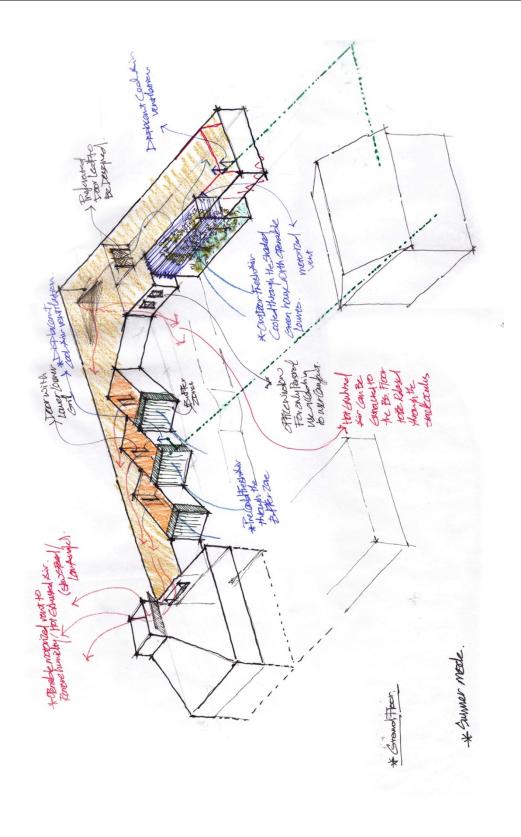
Summer ventilation and cooling scheme _ Ground Floor level
